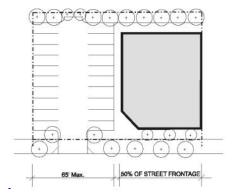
(A): Example of parking width restriction and street frontage requirement.
